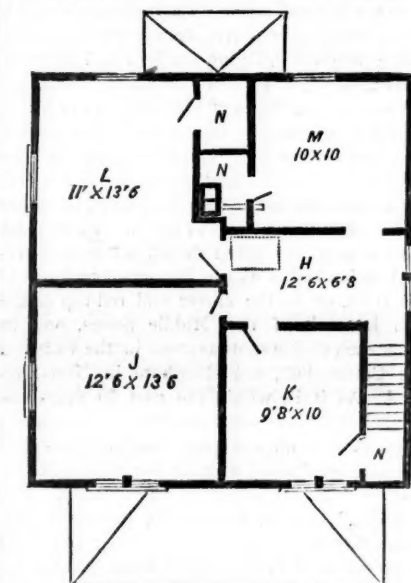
SECOND FLOOR, OR CHAMBER PLAN. H., Hall; J., K., L., M., Bedrooms of the sizes indicated; N., N., Closets. ners, window and door casings, 1½ inches thick, the water-table rabbeted. The cellar stairs to be inclosed with narrow beaded ceiling boards. . . . Cornice, according to plan (fig. 4); that on piazza ½ smaller than that of main roof. . . . Piazza.—Rafters 2 by 4, planed smooth, covered with narrow beaded ceiling stuff; gutter formed to discharge the water at two points. Columns and caps according to fig. 5. . . . Roof and back stoop rafters, covered with 1 inch spruce or hemlock boards, with close joints and well nailed on each rafter. Gutters formed to discharge the water at two points by leaders to the ground. Roofing.—Any good cement or other roofing, the cost not to exceed 5 cts. per square foot. . . . Floors.—1½ inch spruce or pine, wedged tight and well nailed. The divisions into rooms, etc., to be according to the plan. . . . Doors.—All 1st story doors to be 1½ in. thick, double faced and moulded, and 7 feet high; 2d story doors, single faced and moulded, 6 feet 8 in. high. Fixed lights over front and back doors. . . . Windows.—2 first story windows with 7-inch mullions, lights 10 by 15, 8 in each half; 3 windows with 12 lights of the same size each; 3 second story
